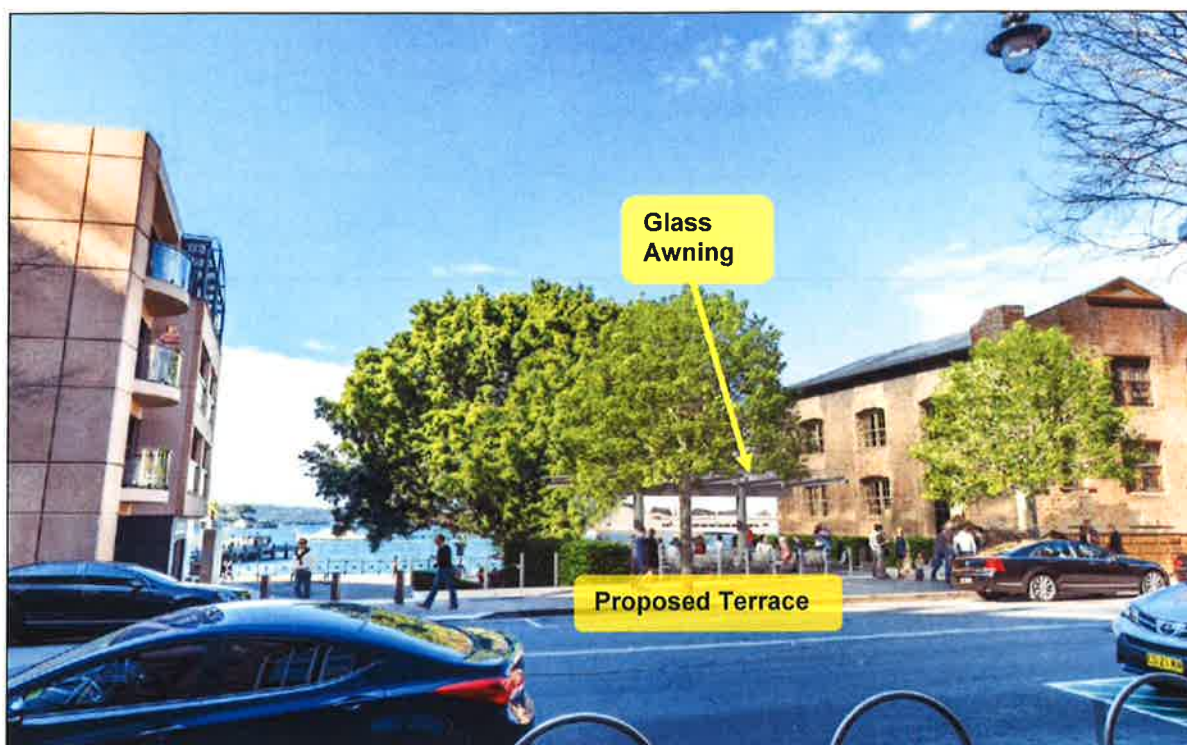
The proposed Bay 12 landscaped terrace, viewed from Hickson Road (Source: Applicant's EIS).
